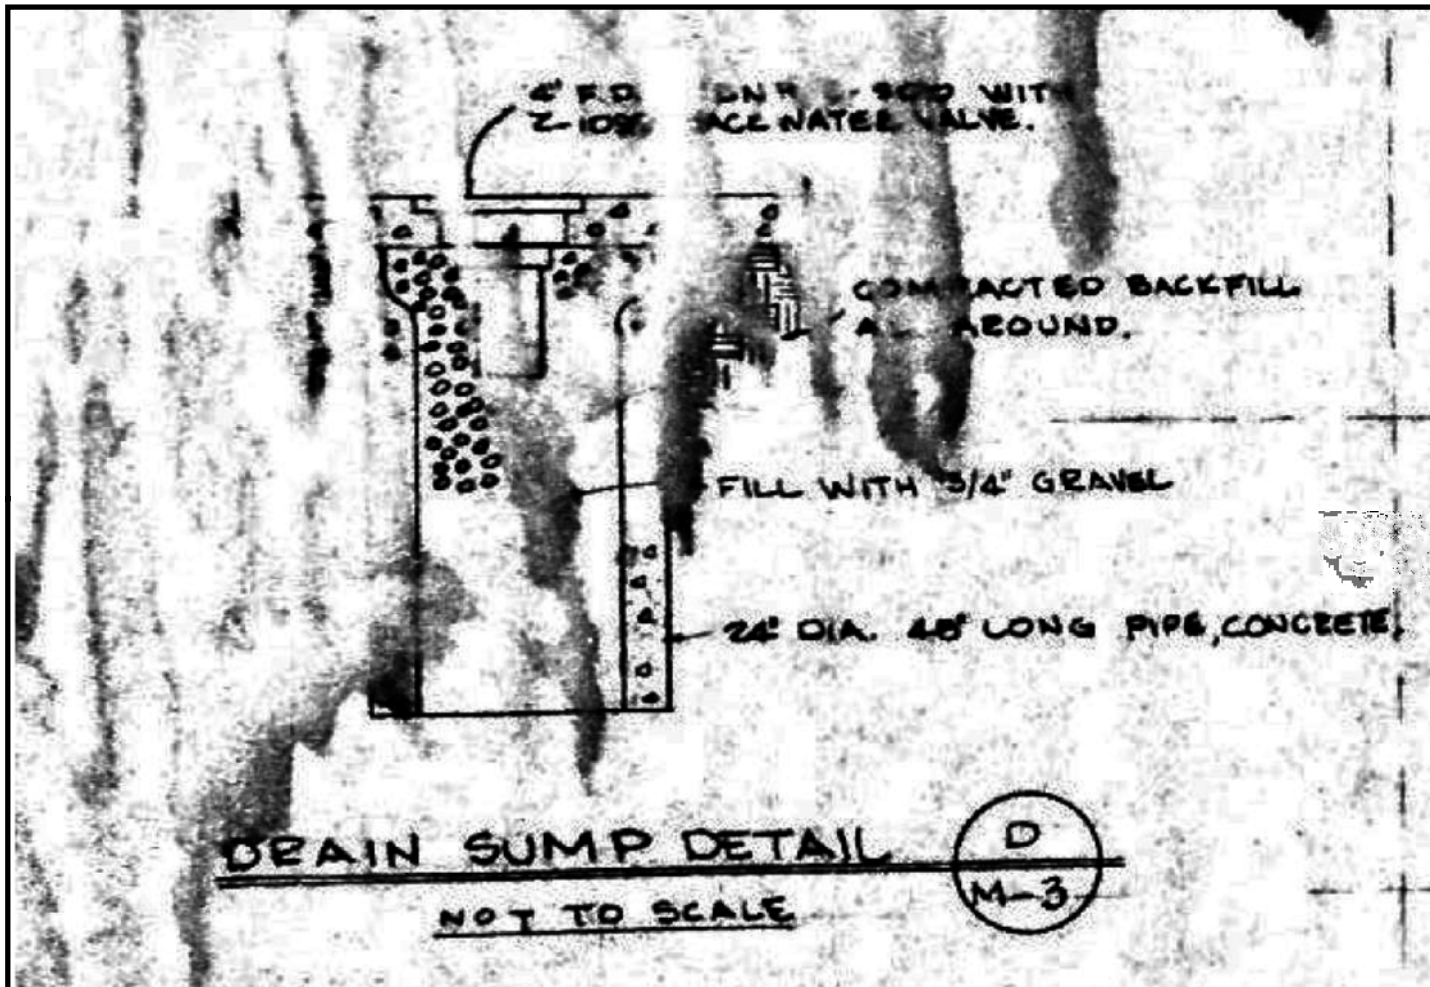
Image clipped from 1974 Cordova Airport ARFF Building Plans. Plans were damaged in storage. No as-built details are available. We assume construction based on plans.
